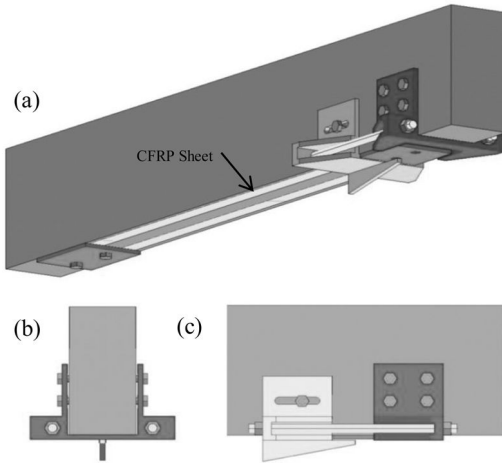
EB technique end steel anchors (blue plates) along with temporary anchorage system components: (a) isometric view, (b) elevation, (c) side-view.
